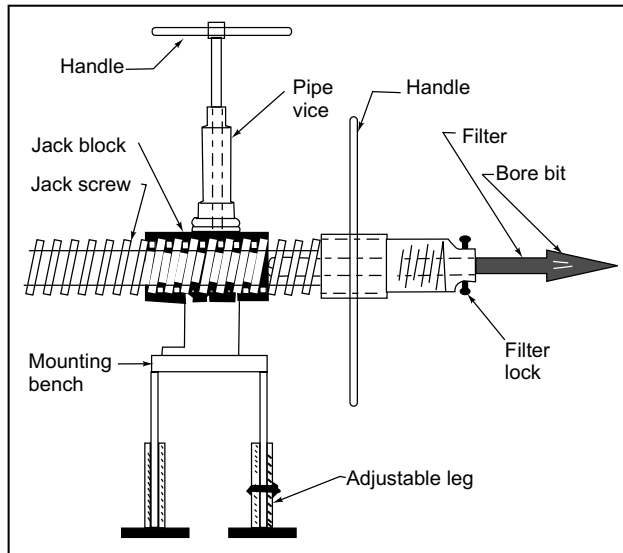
(a) Details of radial boring equipment for installing filter in open wells
